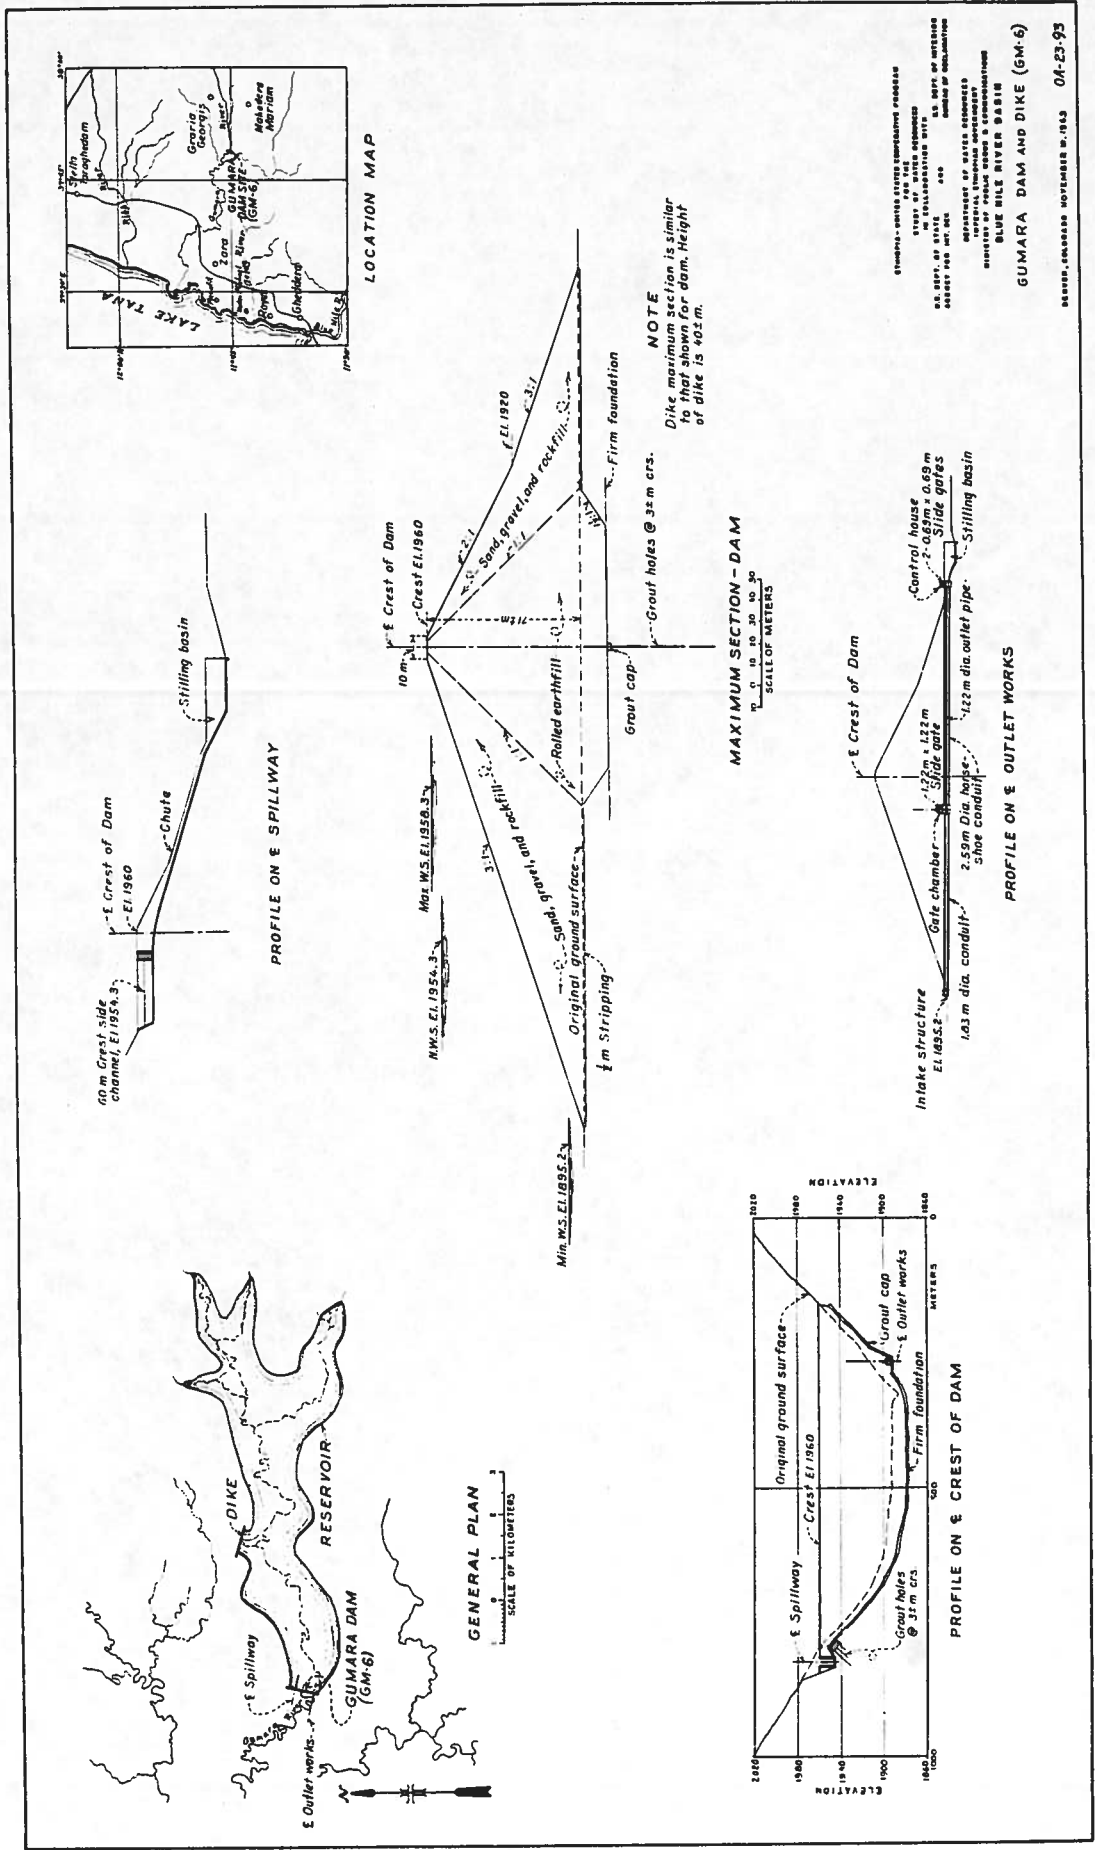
Gumara Dam and Dike (GM-6)--Plan and Sections
